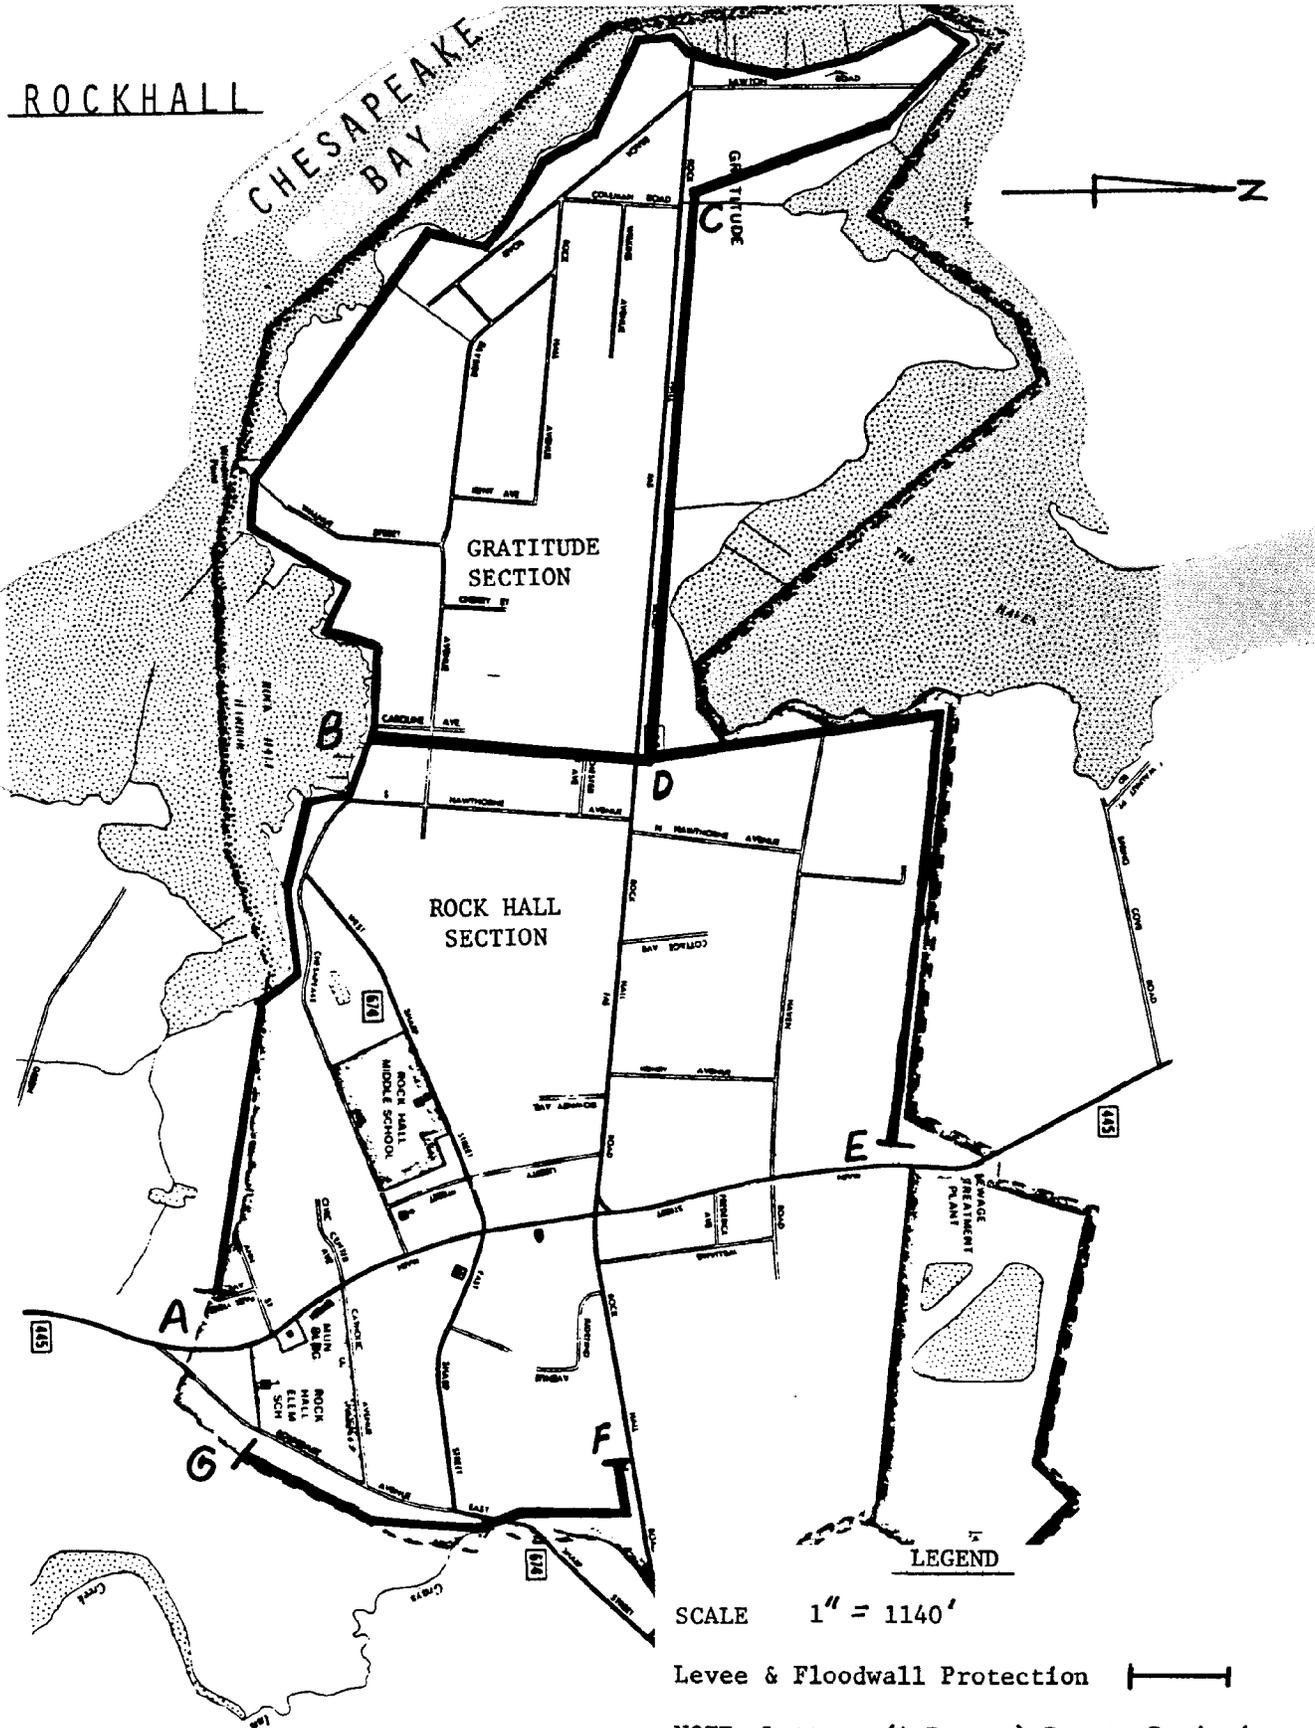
ROCK HALL PLANS OF IMPROVEMENT
